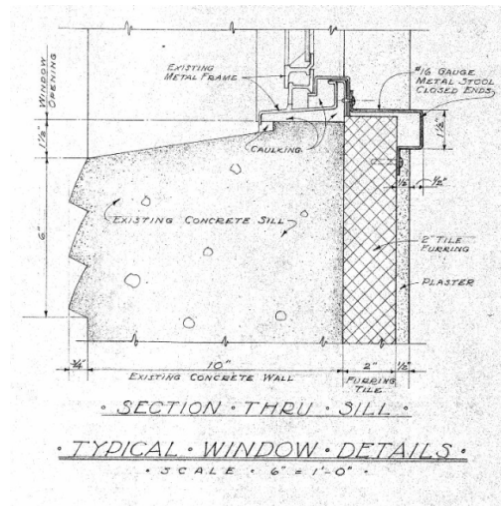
Typical Administration Building Wall Section<sup>5</sup>
